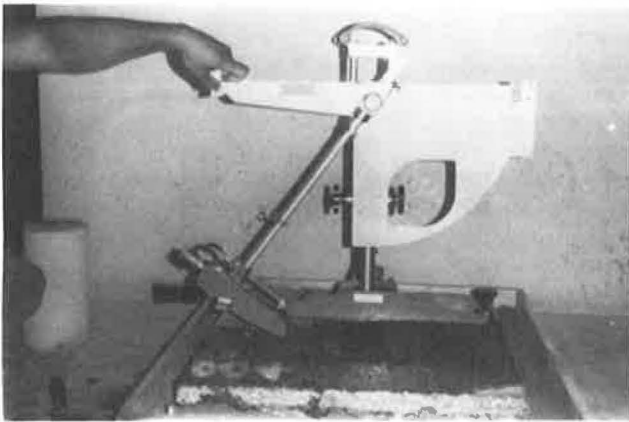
Testing pavement slab using British Portable Pendulum.
